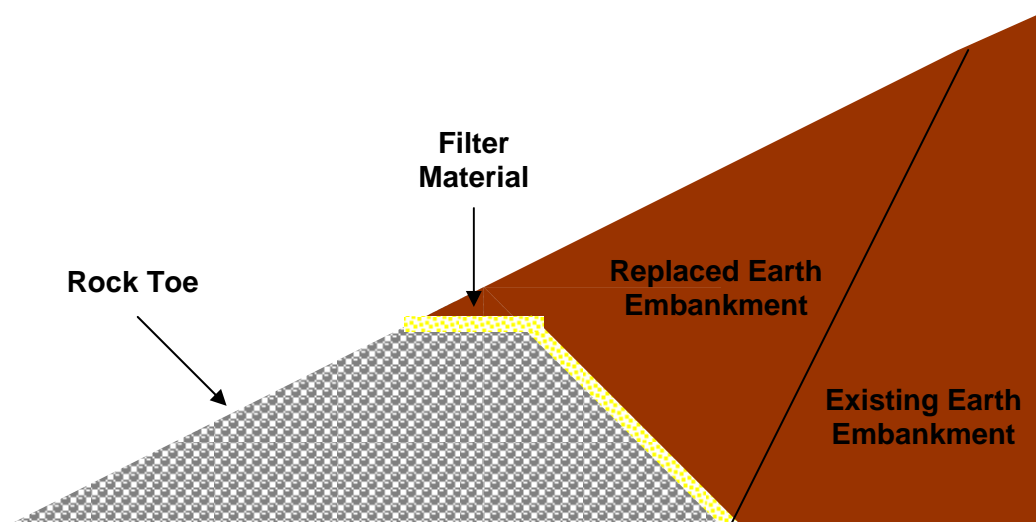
Shallow Excavation, Filter Construction, and Replacement
